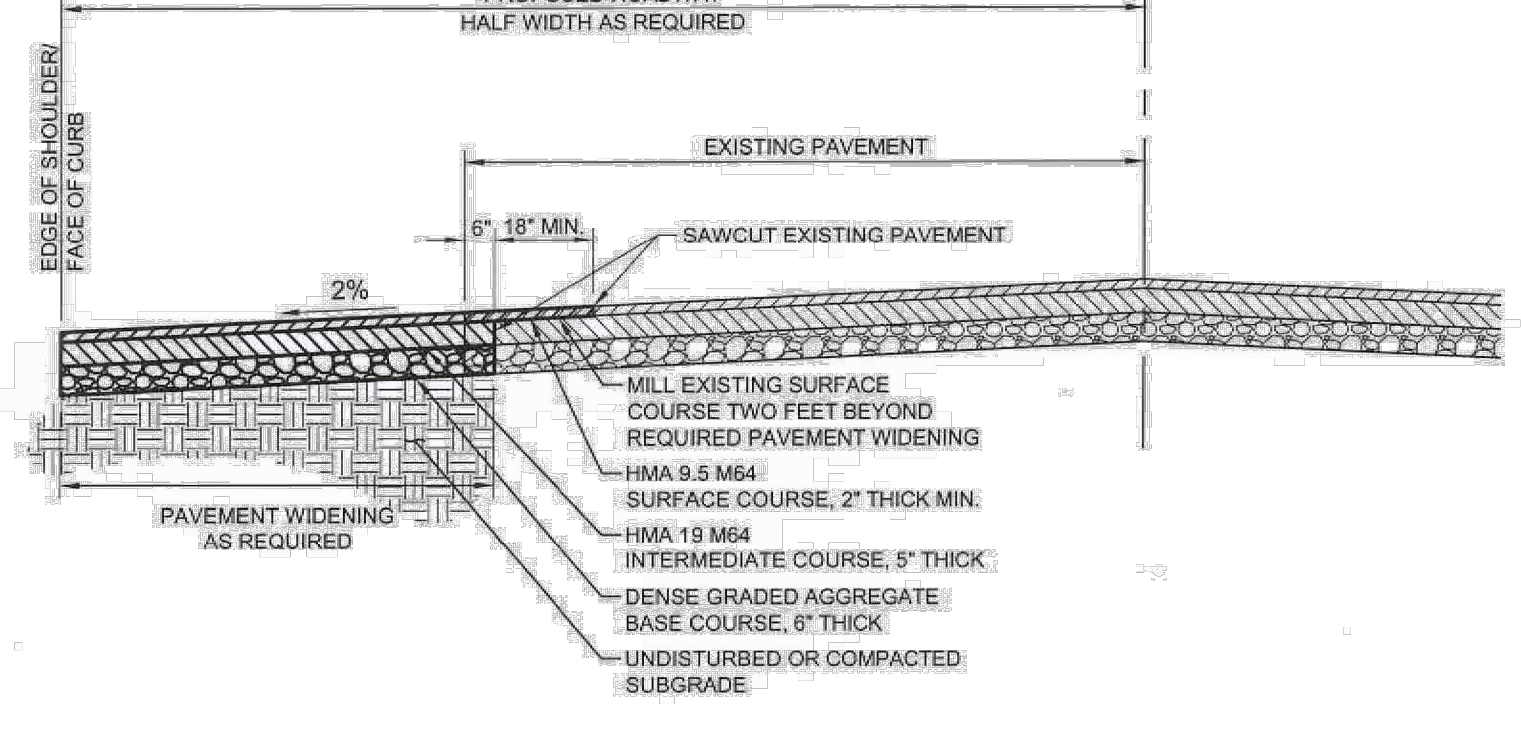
MORRIS COUNTY TYPICAL DETAIL PAVEMENT WIDENING SECTION (P3%) NOT TO SCALE 5/2011 MOC
